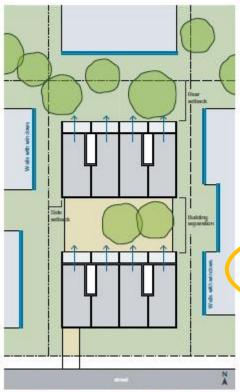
H.3 On narrow infili sites select a building type that orientates habitable rooms to the street and rear, minimising required side setbacks
